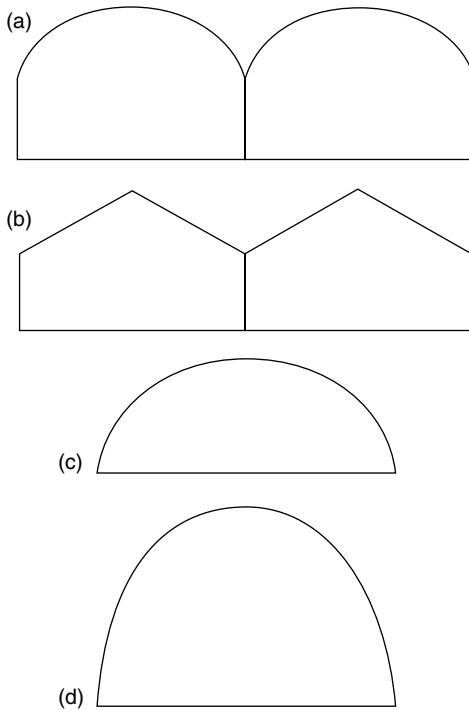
Shapes of greenhouse frames: (a) gutter-connected straight sidewall with arch roof; (b) ridge-and-furrow style straight sidewall with gable roof; (c) hoop or quonset style; (d) Gothic-arch frame.
